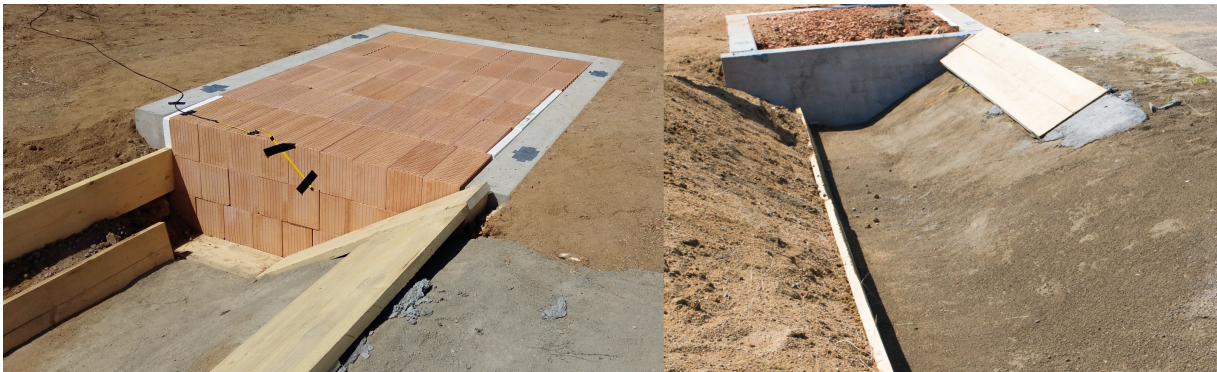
Drainage ditch with an integrated deformation zone – test No. 001 (left) and drainage ditch of classical construction (concrete face) – test No. 002 (right).
